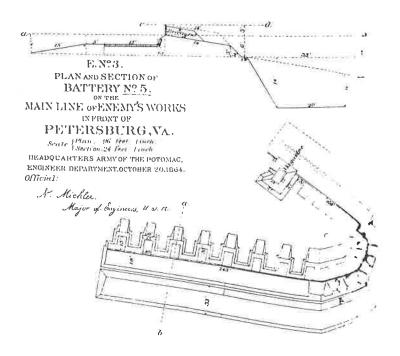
Plan and profile of Battery 5, 1864 (O.R. Atlas Plate CIV, No. 10)
